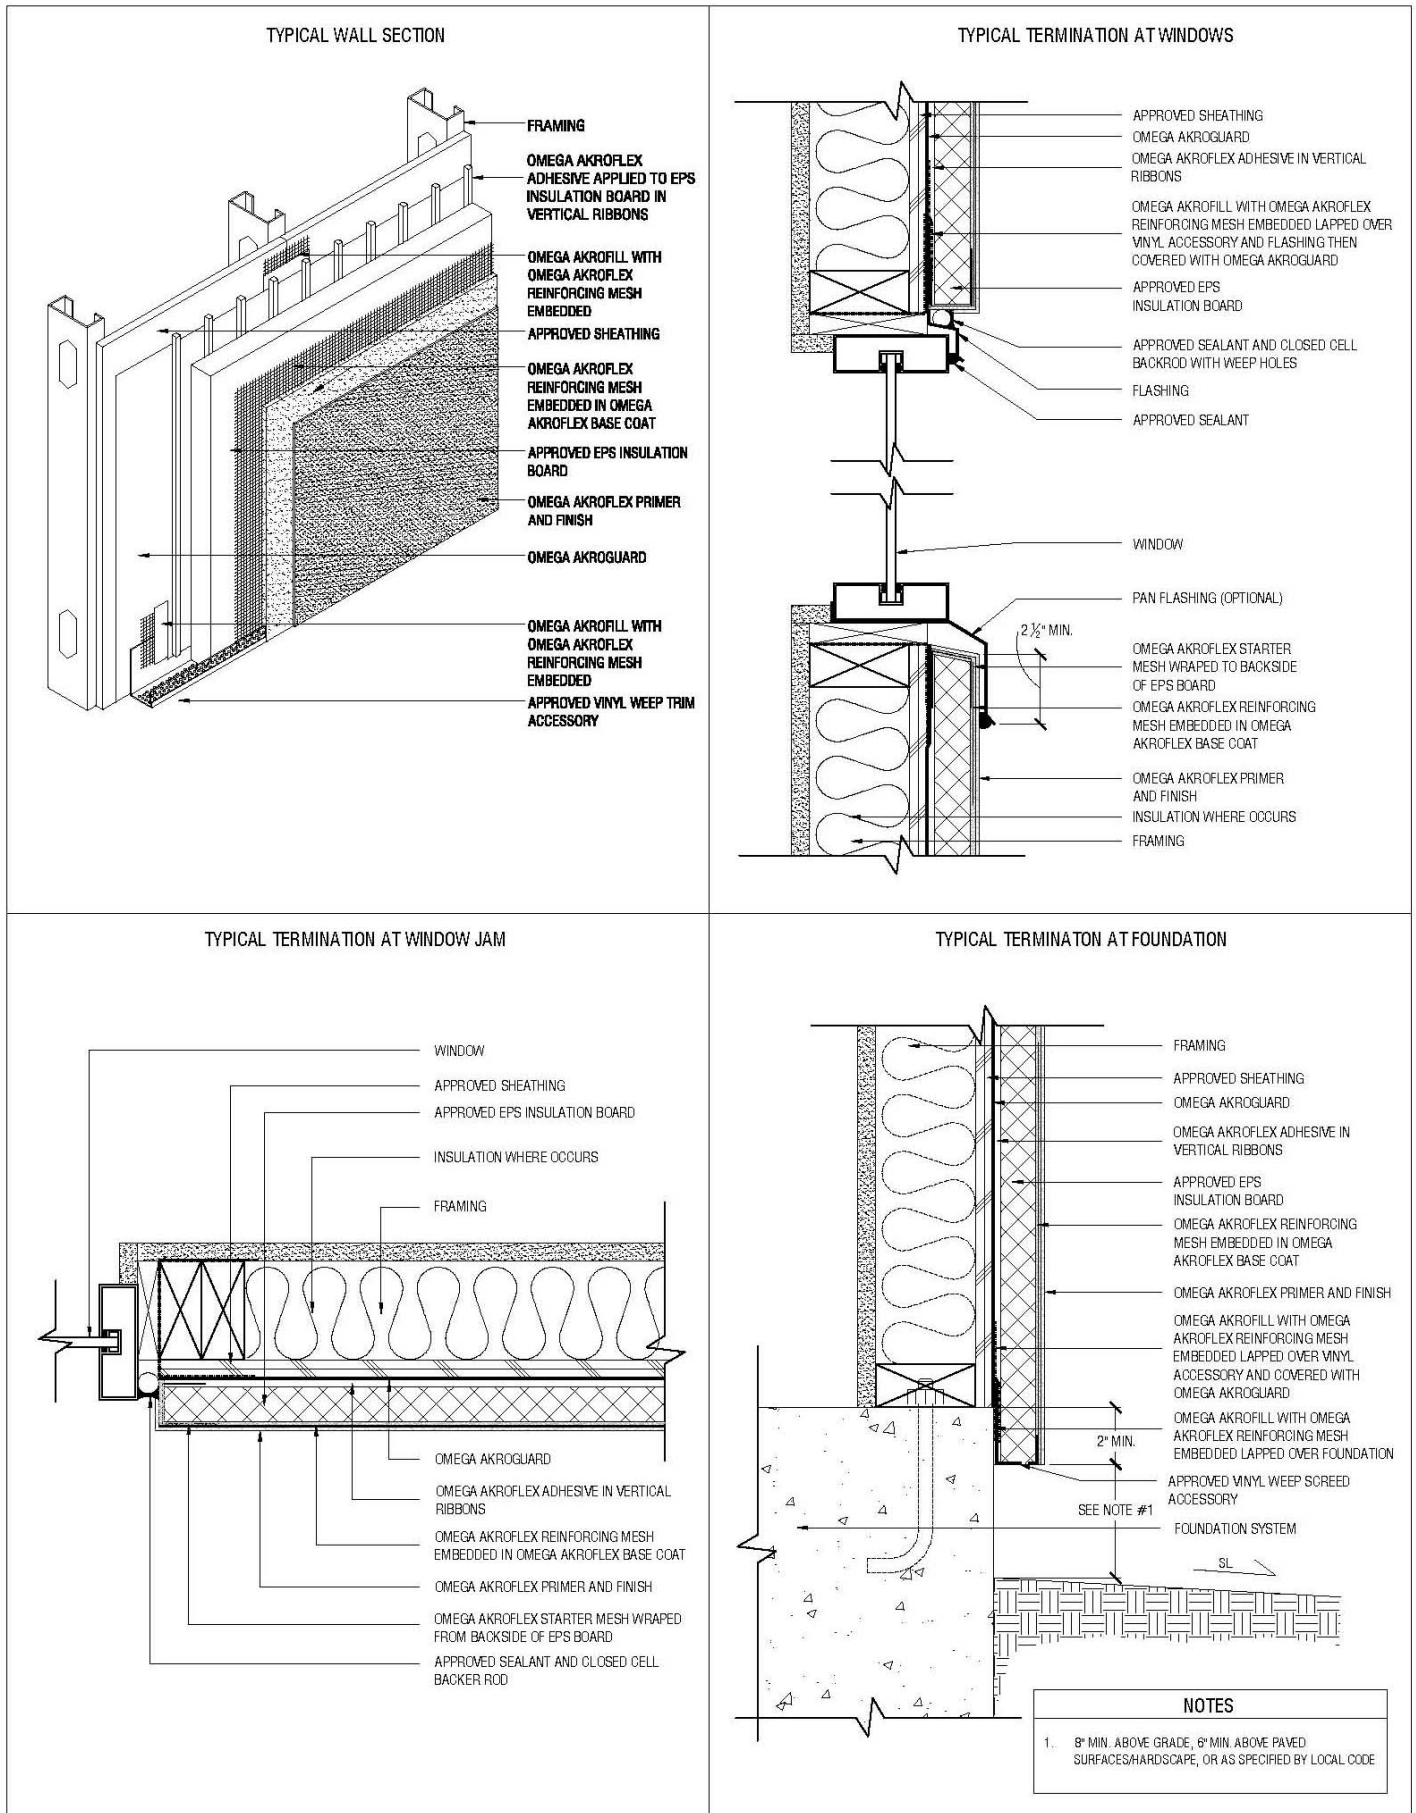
TYPICAL INSTALLATION DETAILS FOR THE AKROFLEX WM+ SYSTEM
